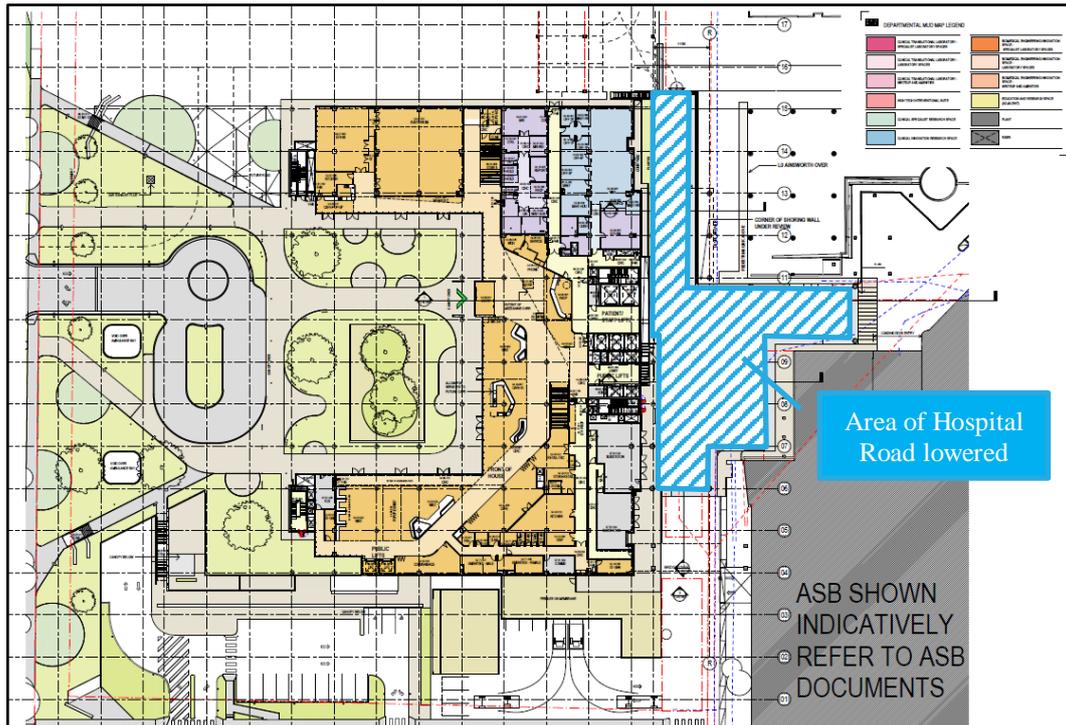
Proposed ASB Addition showing lowering of Hospital Road (Source: BVN, 2019)
